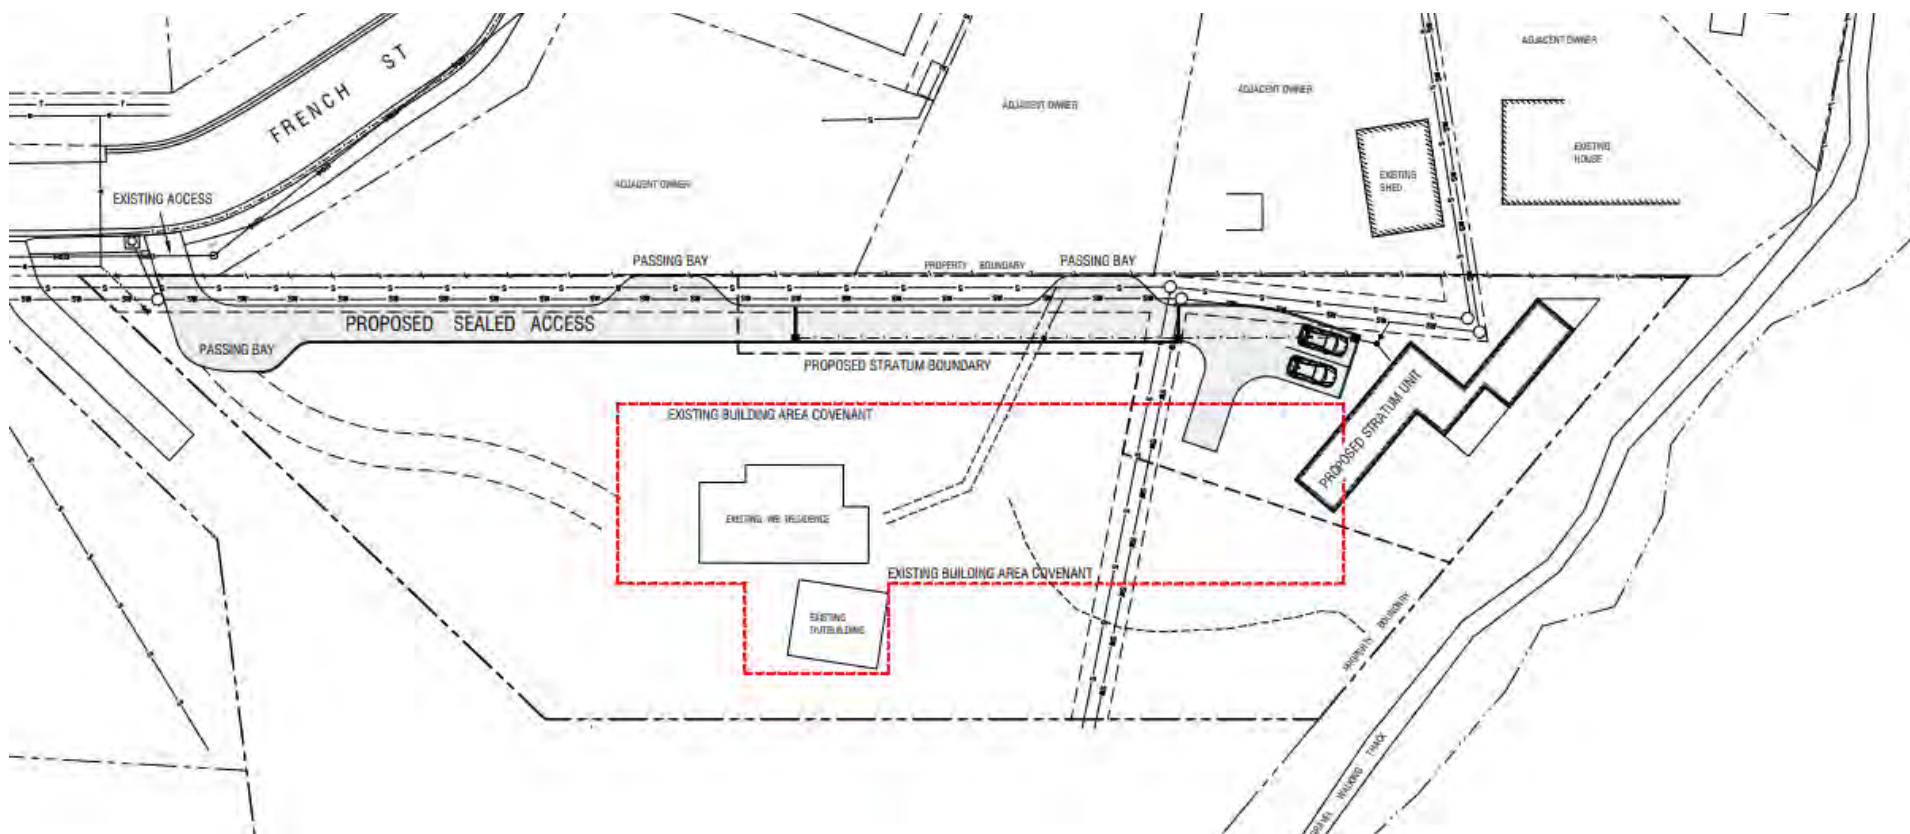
the Site Plan showing the building area on the Plan of Subdivision in red. The proposed stratum unit is seen on the right-hand side of the drawing with only one corner inside the building area on the title (Documents submitted with the application).
